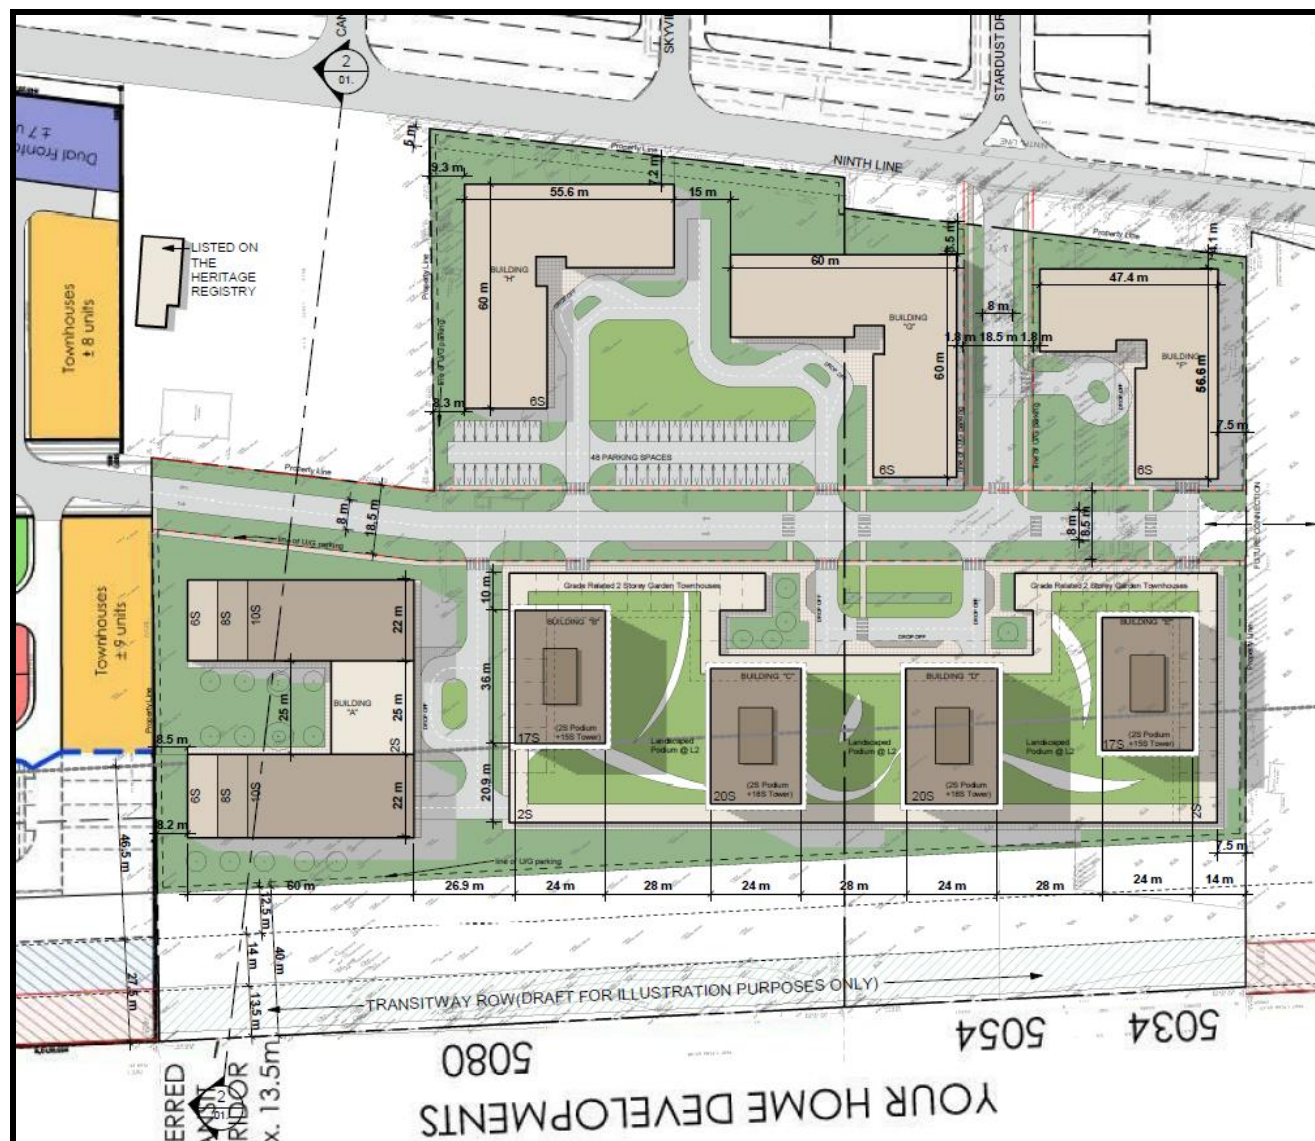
Site/Concept Plan August 2020 Draft Proposal
